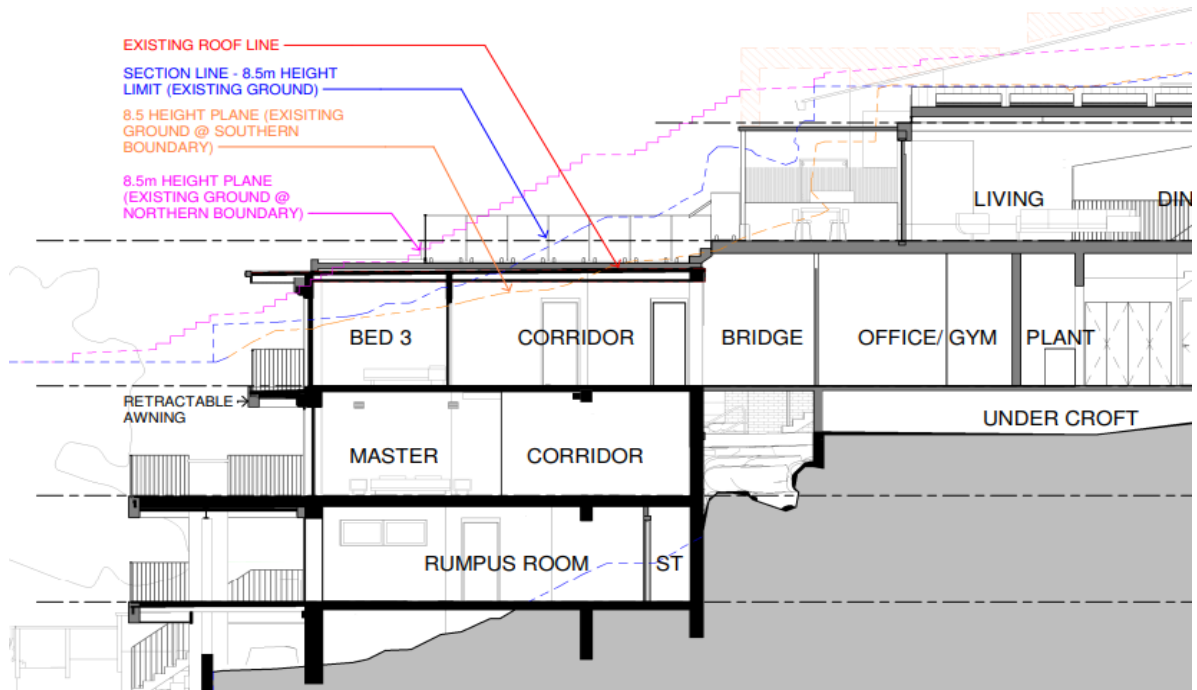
Plan extract showing 8.5 metre building height breaching elements
